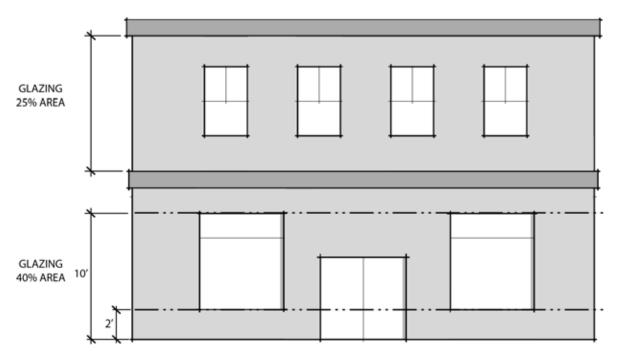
Commercial or mixed use building meeting glazing requirements
